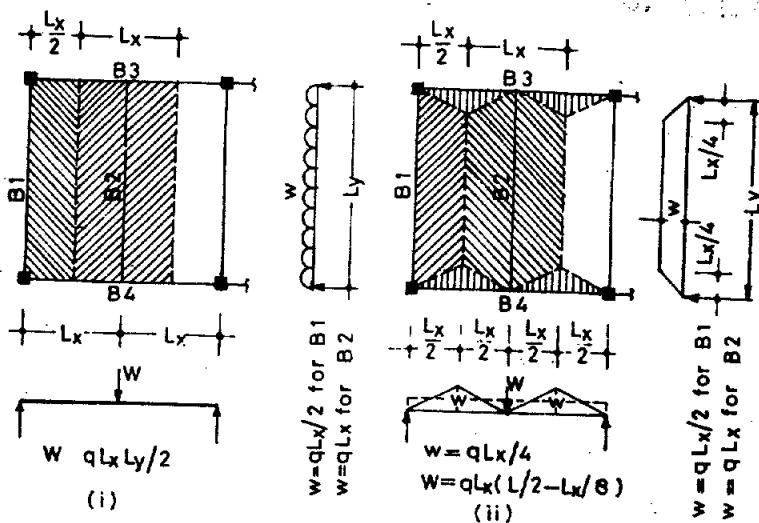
(d) Loads on Secondary Beams supporting One-way Slabs
